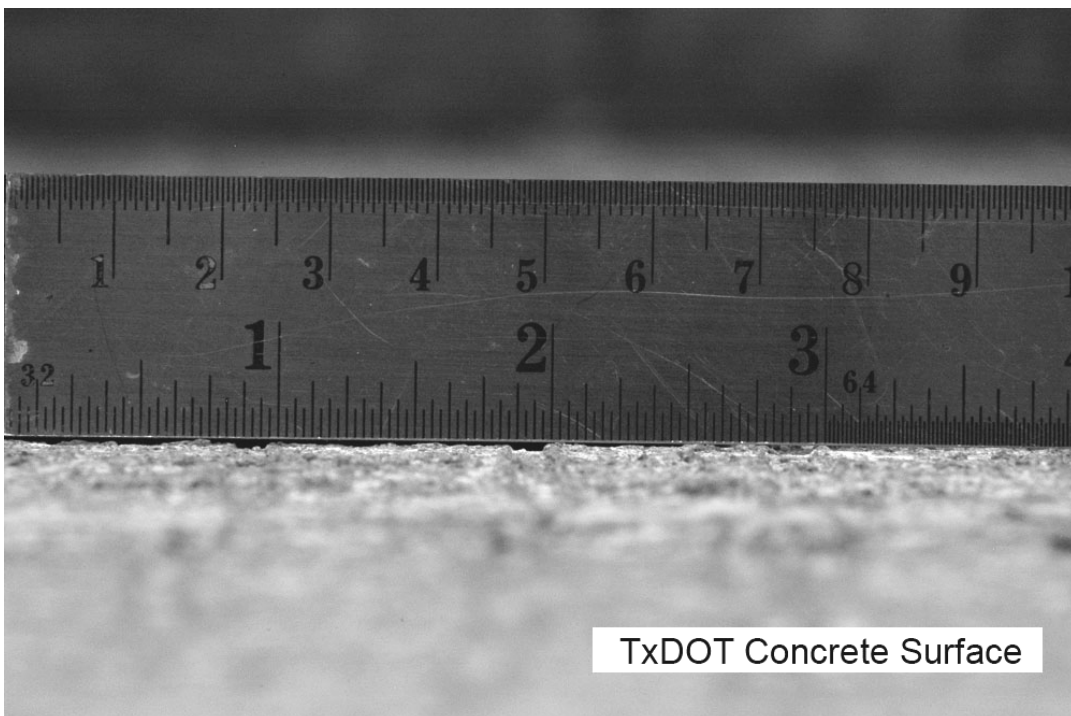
TxDOT concrete roadway surface (longitudinal cross-section)
